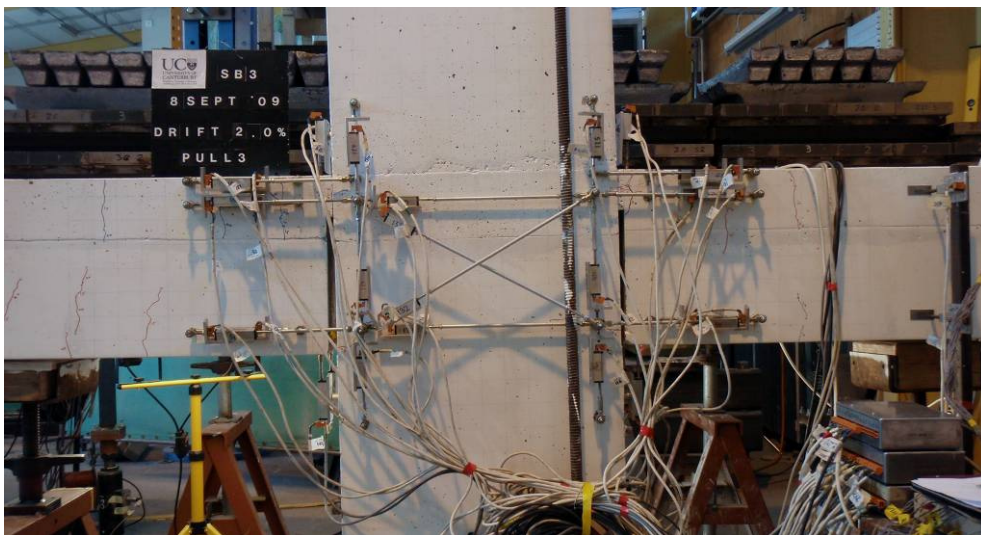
illustrates the development of cracks on the face of the beam-column subassembly. All flexural cracks along the beam and column lengths where reinforcement remained elastic were less than 0.15 mm and closed on unloading. No cracking was observed in the joint until 3.5% drift. Significant flexural cracking was concentrated into one or two cracks passing through the concrete top-hinge as shown in Figure 5-20. This same figure also highlights the relatively low concrete damage sustained by the slotted connection.
